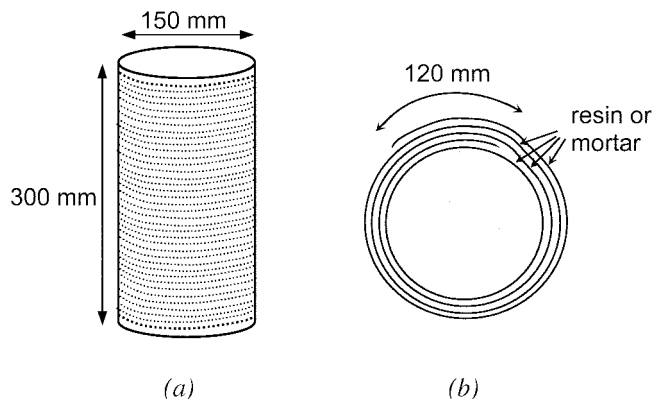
(a) Concrete cylinders with FRP or TRM jackets; and (b) cross section.
